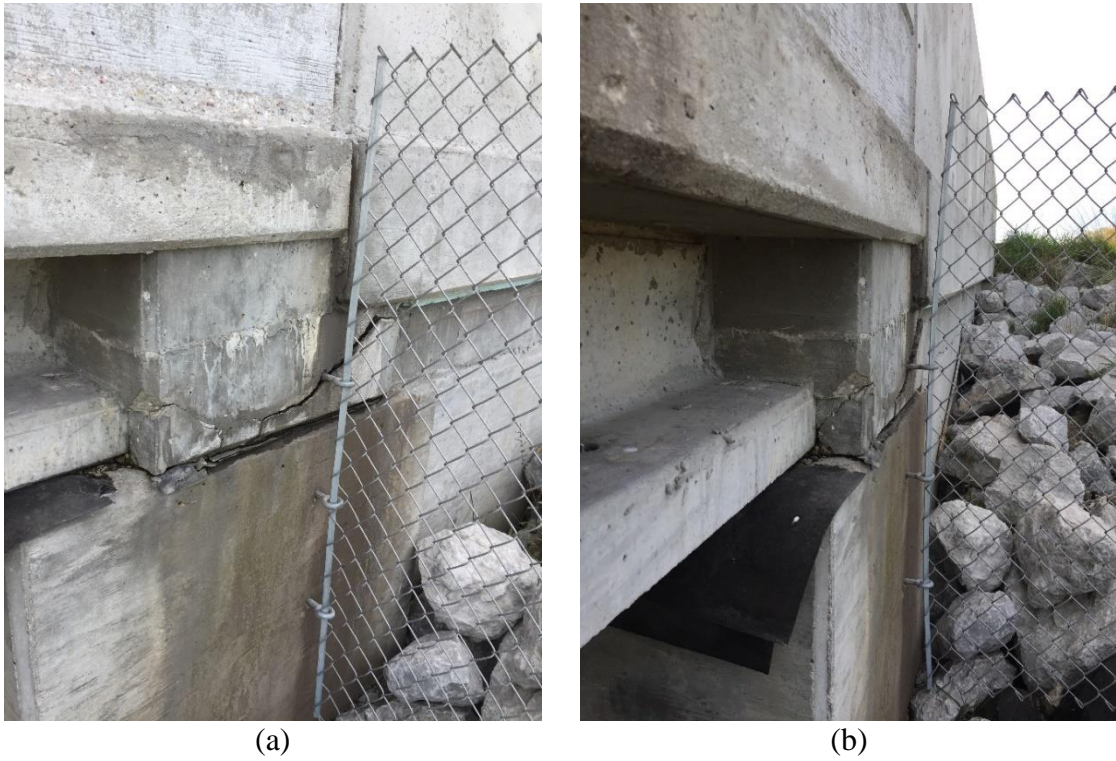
Damaged northwest abutment on bridge S080 40872R.
